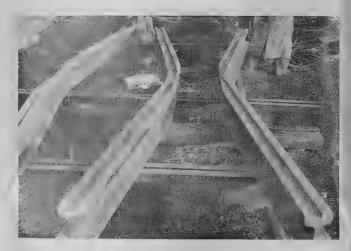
Welding preparations at a mounting tongue consisting of heavy web rails
